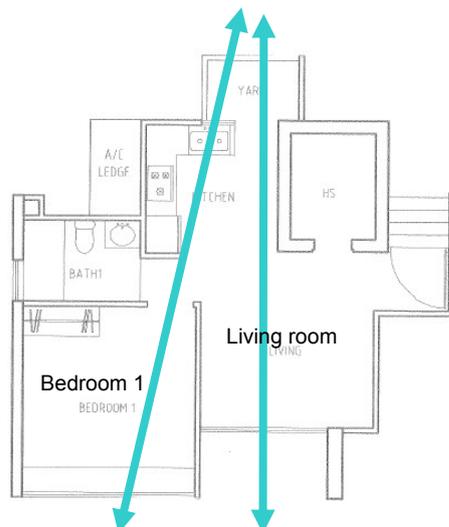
Dwelling unit layout showing that both living room and bedroom 1 are considered to have true cross ventilation and meet the requirement 1-2(a) Option 2(i)
